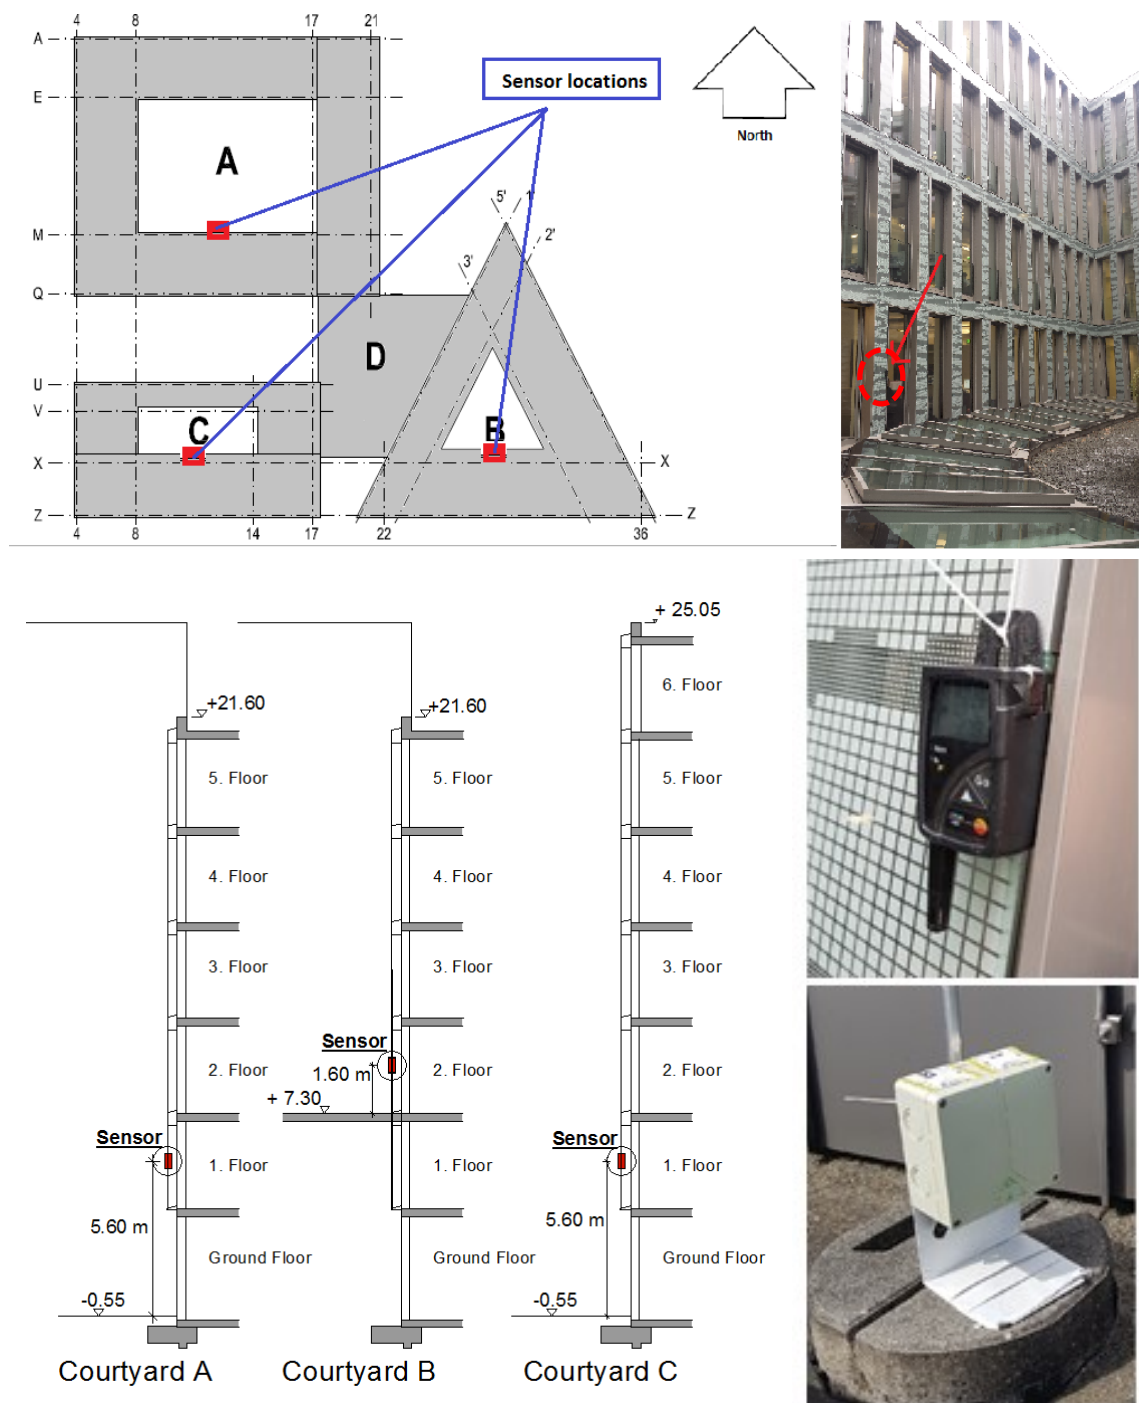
VHV- Group office building with the studied courtyard spaces- Photo, plan and elevation drawing of measurement setup
